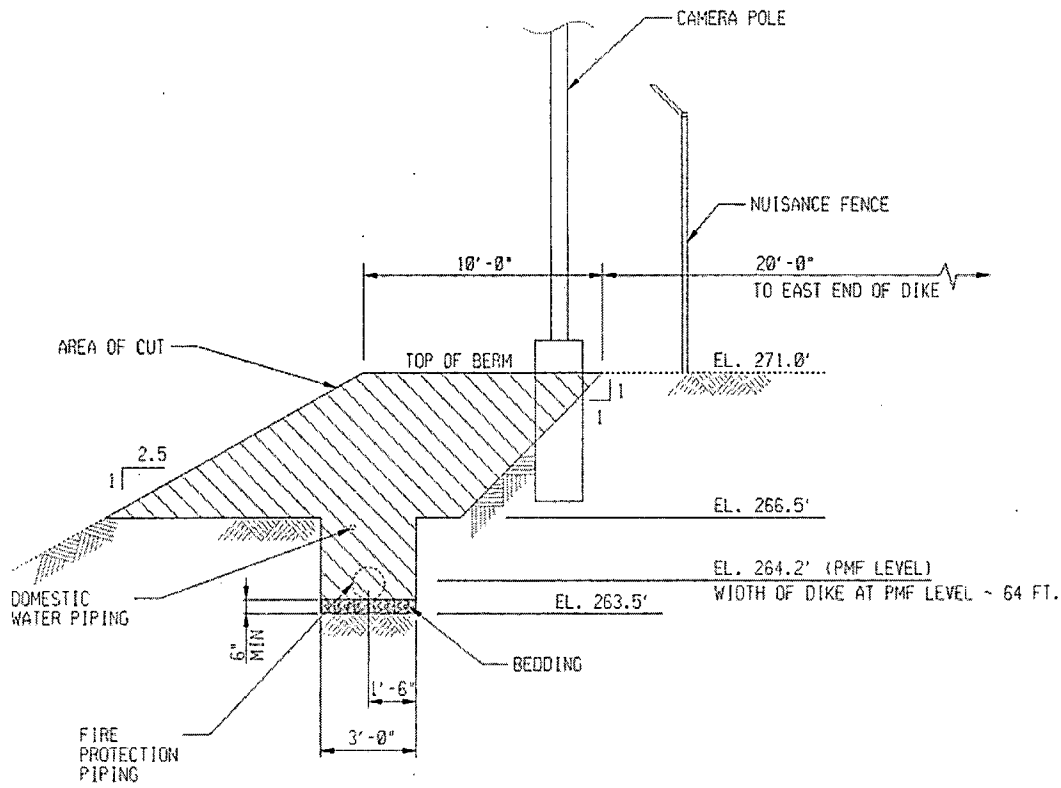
Trench Detail for FPS and DWS Installation in Flood Protection Dike
